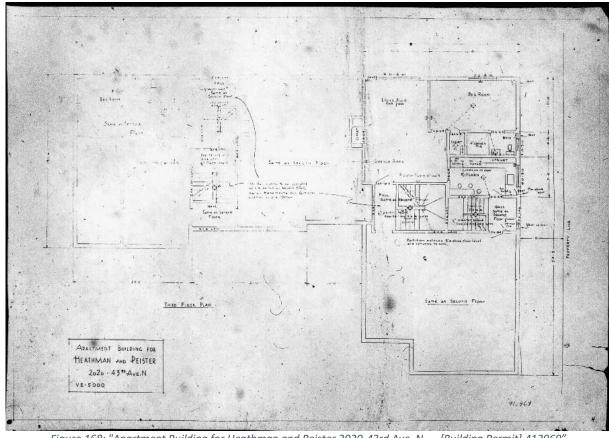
"Apartment Building for Heathman and Peister 2020-43rd Ave. N. ... [Building Permit] 412969"
